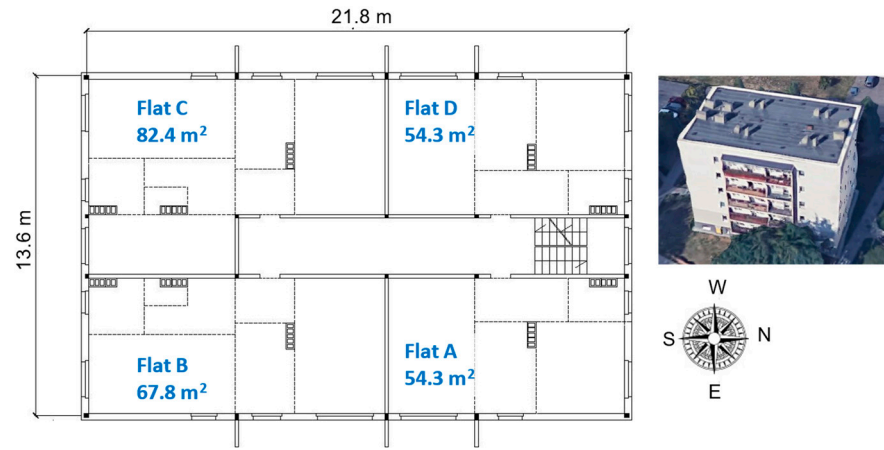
Plan of the floors; flat C on the ground floor is smaller due to the entrance to the building.
